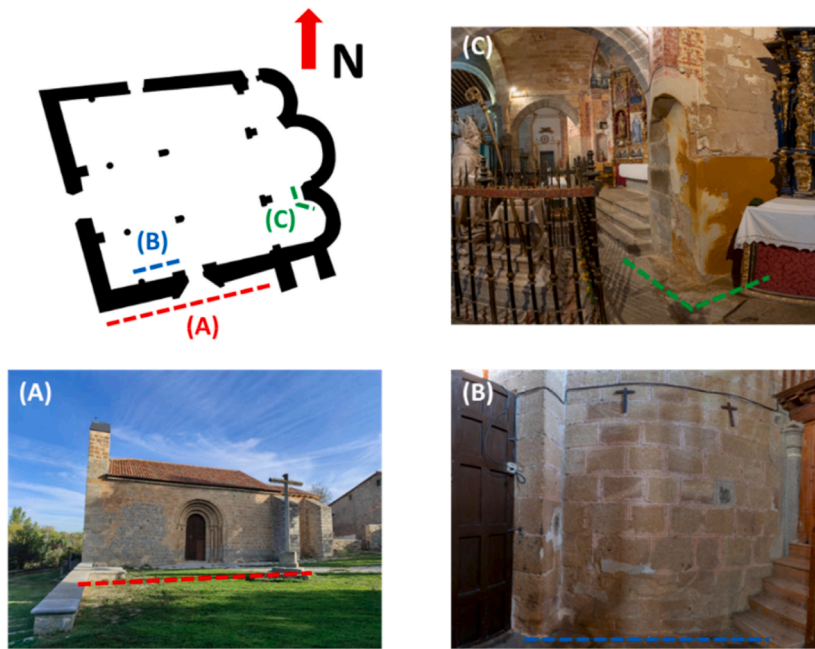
(a) and (b) south façade wall, interior and exterior of the wall. (c) View of the altar.
